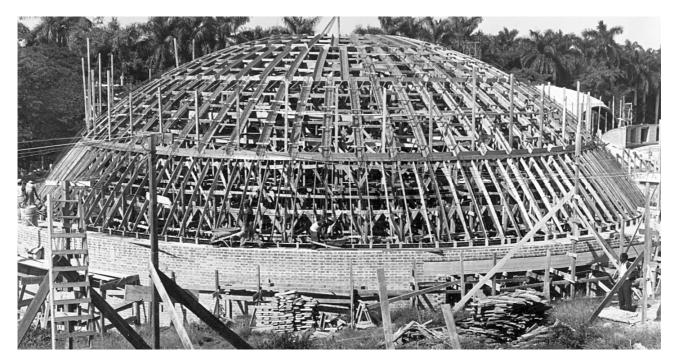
Choreography Theater: formworks and rebar arrangement (ISA archive).
